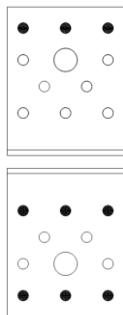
Forces - Beam to beam connection with purlin ties ( $F_1$ )
